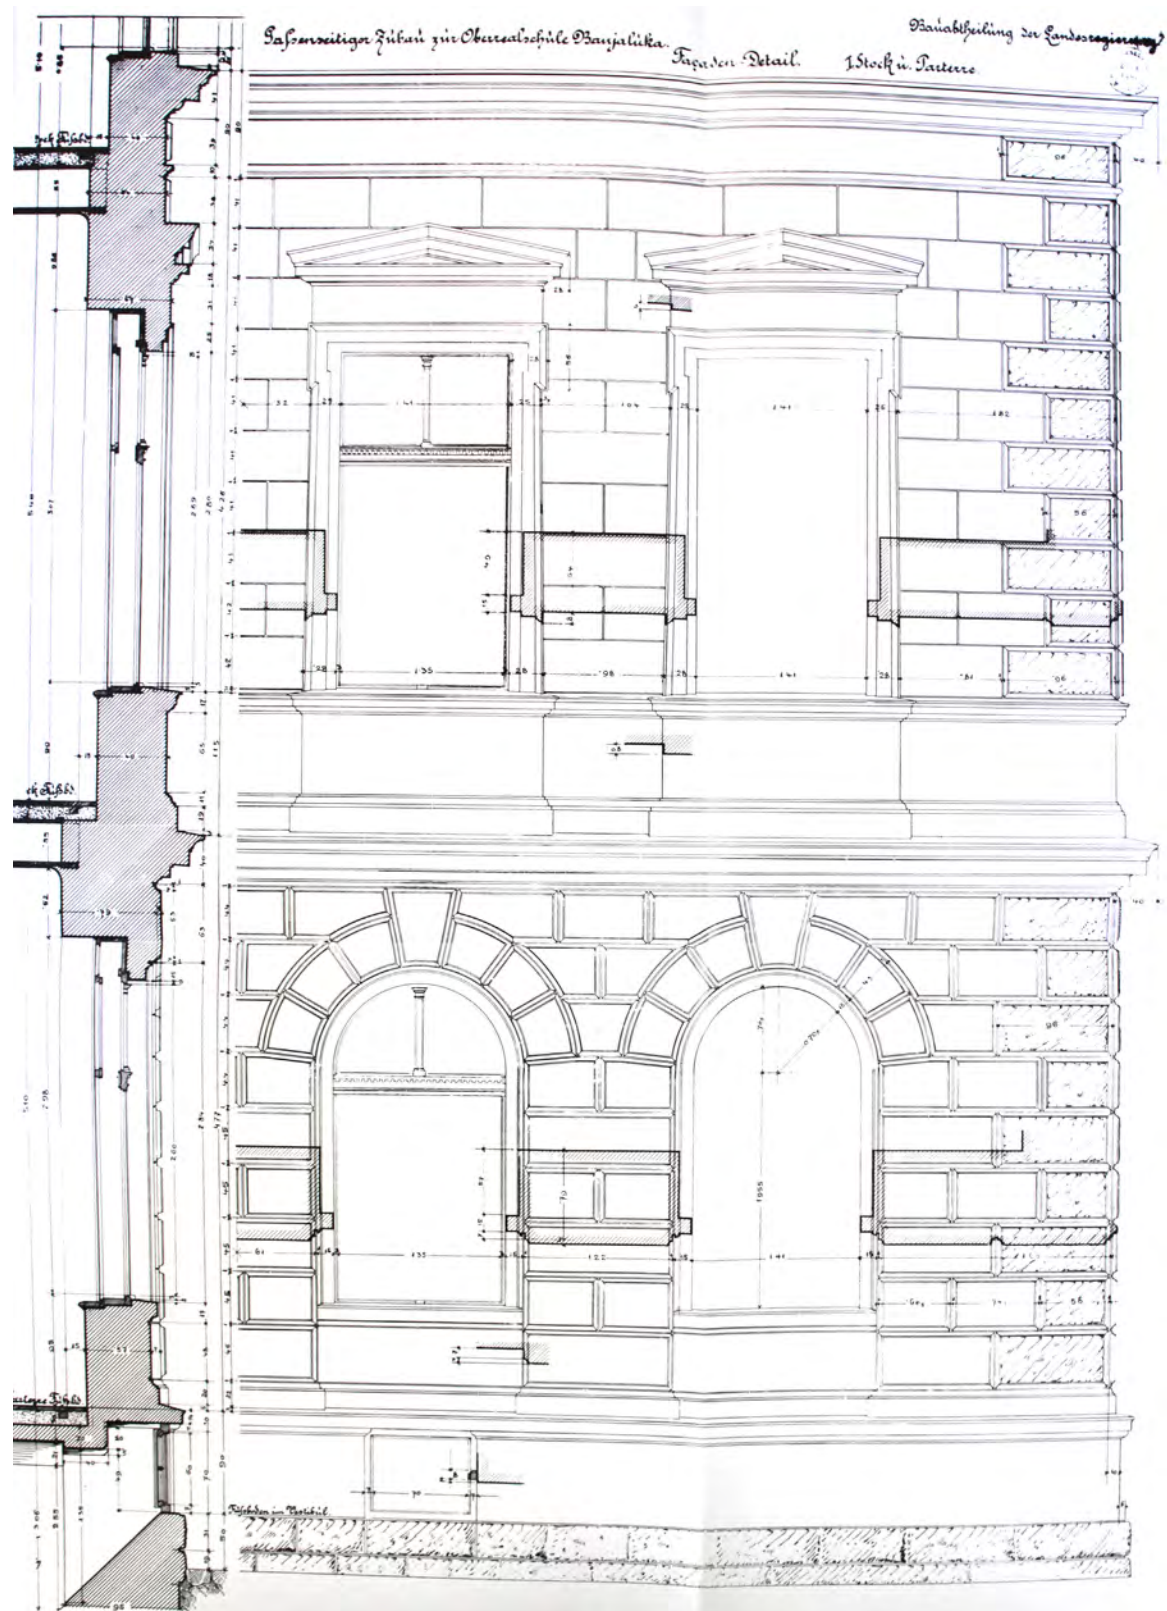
Real Gymnasium in Banja Luka; section detail between ground and first floor with cornices between.
